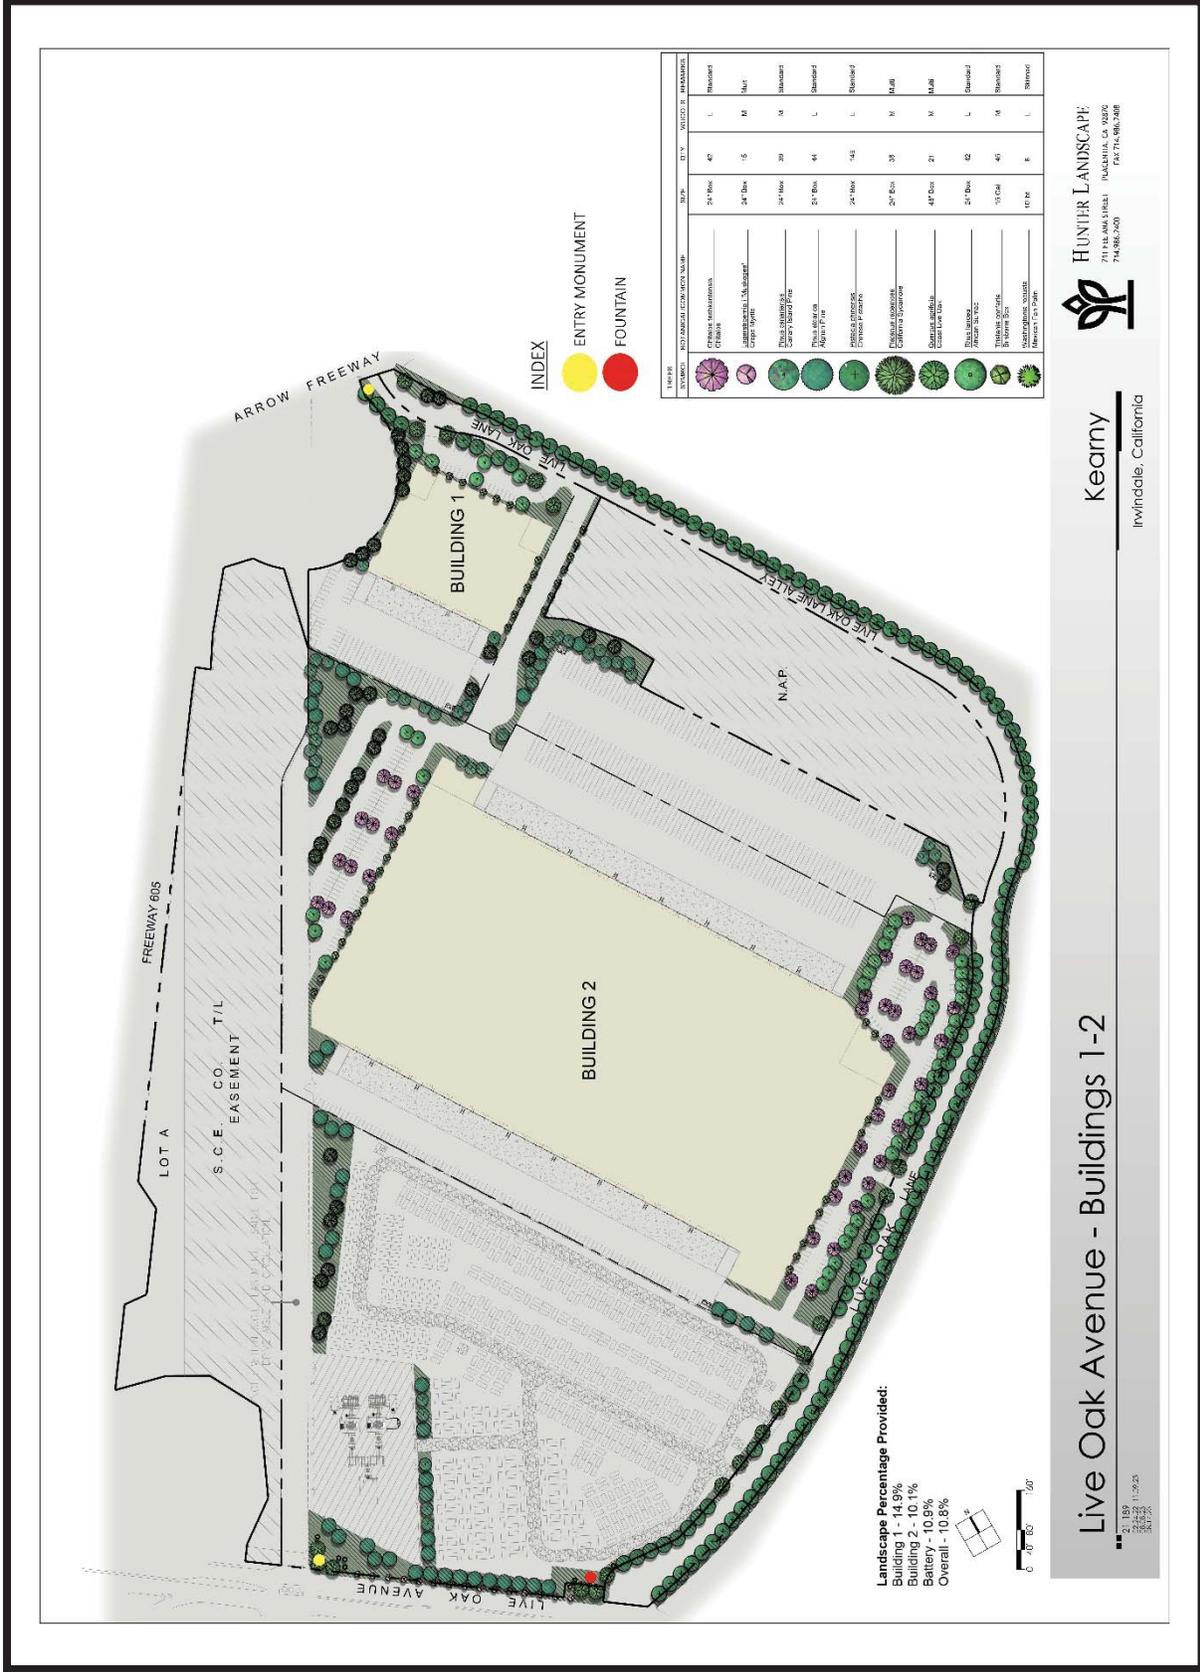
CONCEPTUAL LANDSCAPE PLAN WITH BESS
